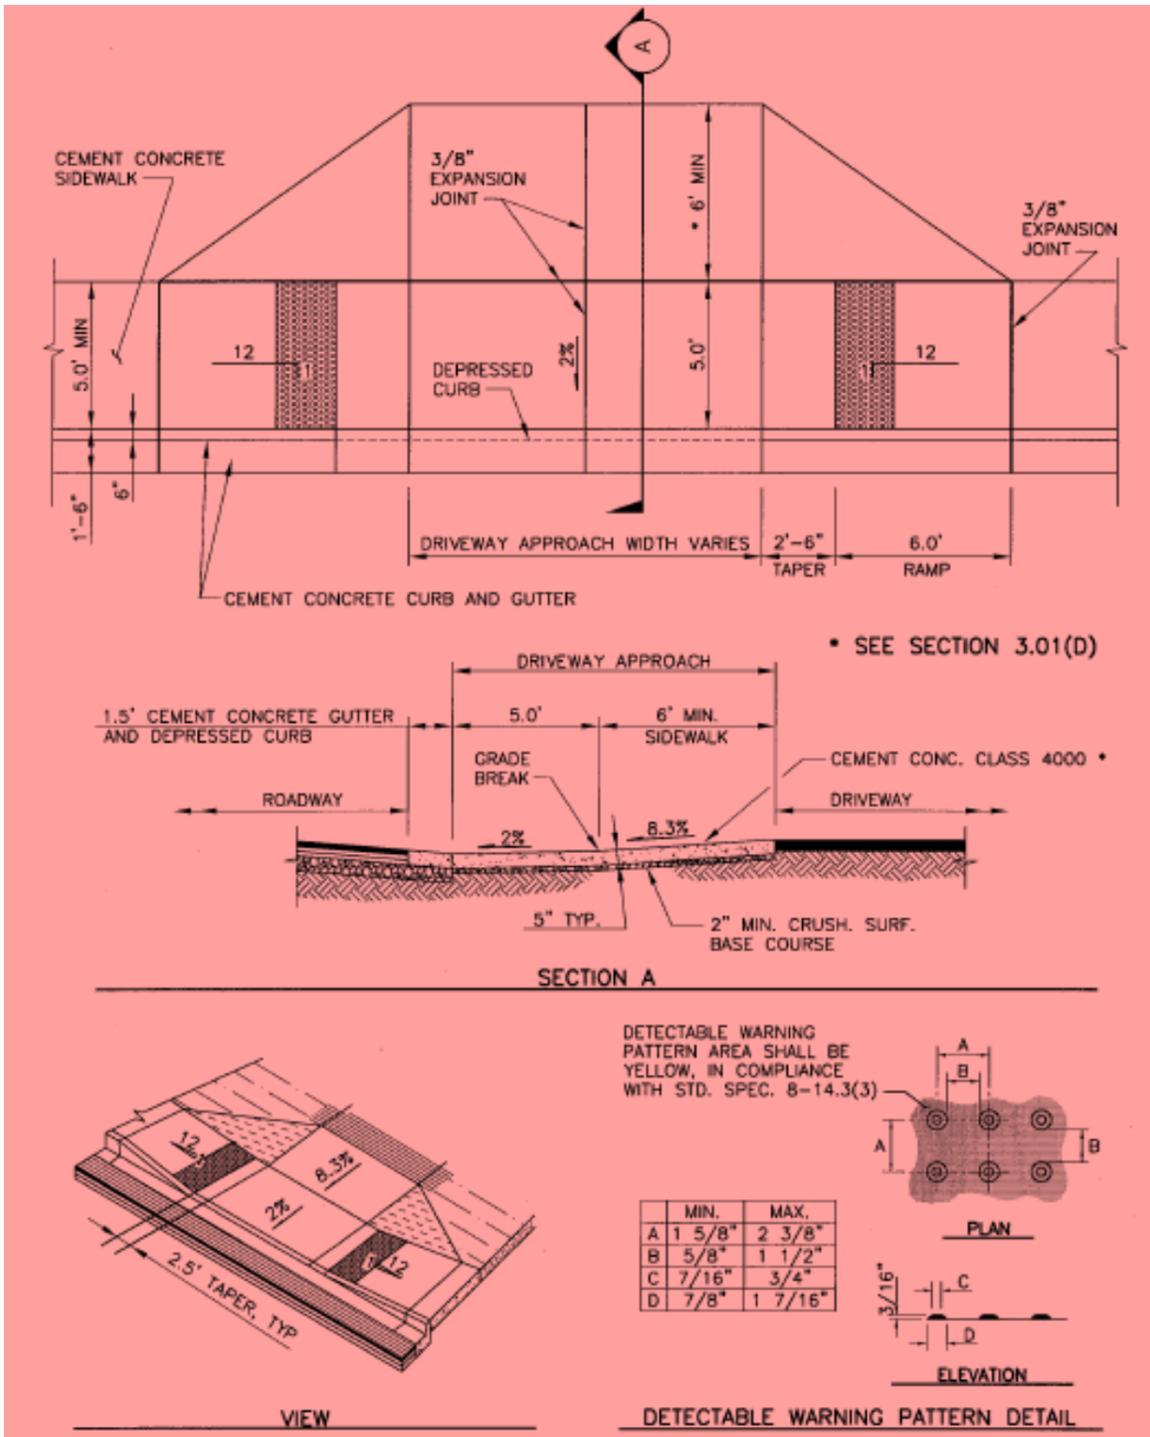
LOCATION AND WIDTH OF NEW DRIVEWAYS
